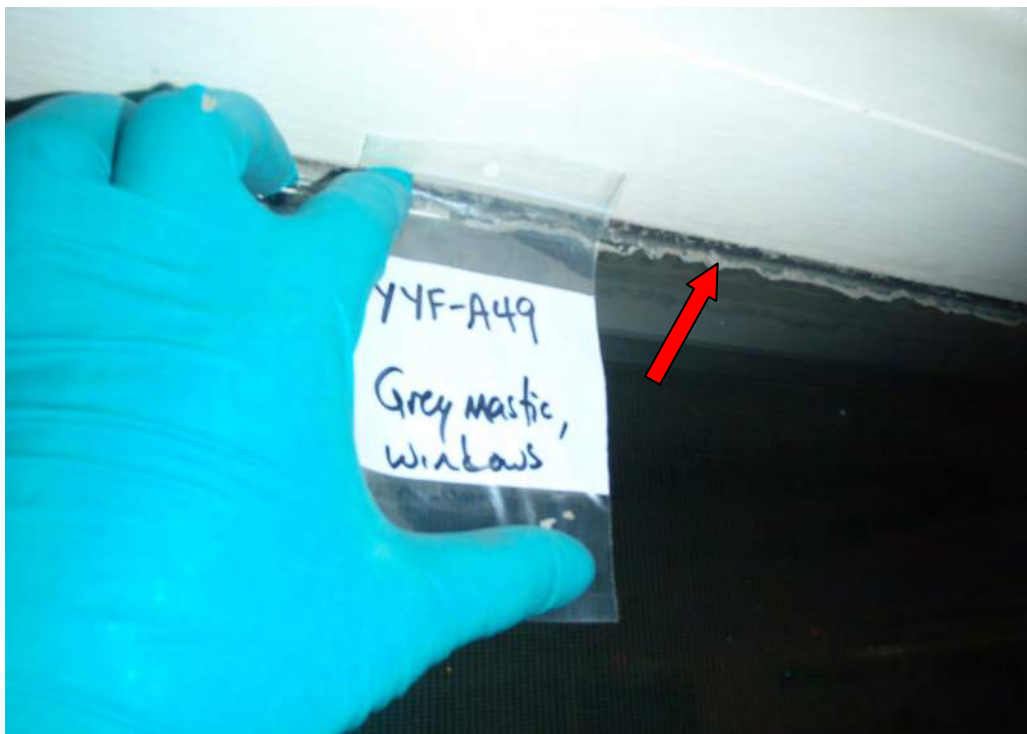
Asbestos-containing grey window putty in Room 120 (Sample A43).
